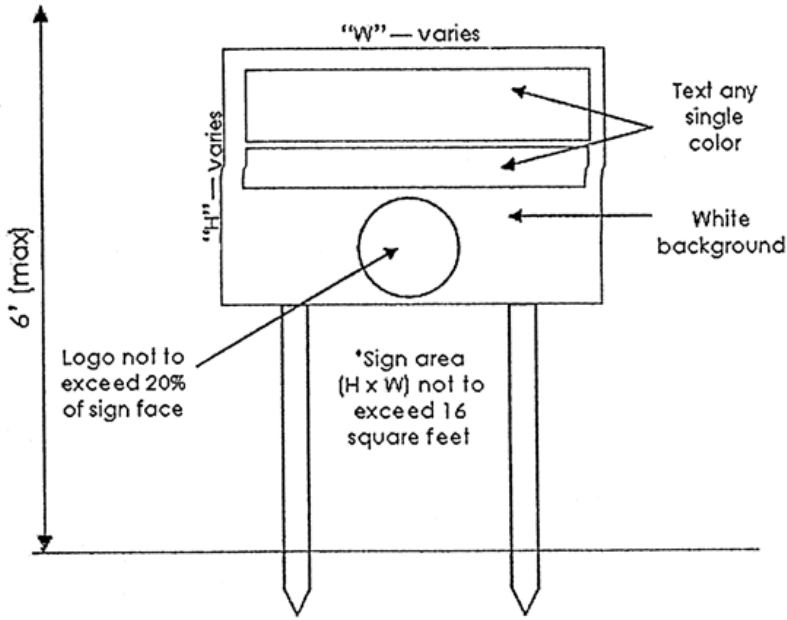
Signs for properties with building permit or site development plan in multi-family districts
